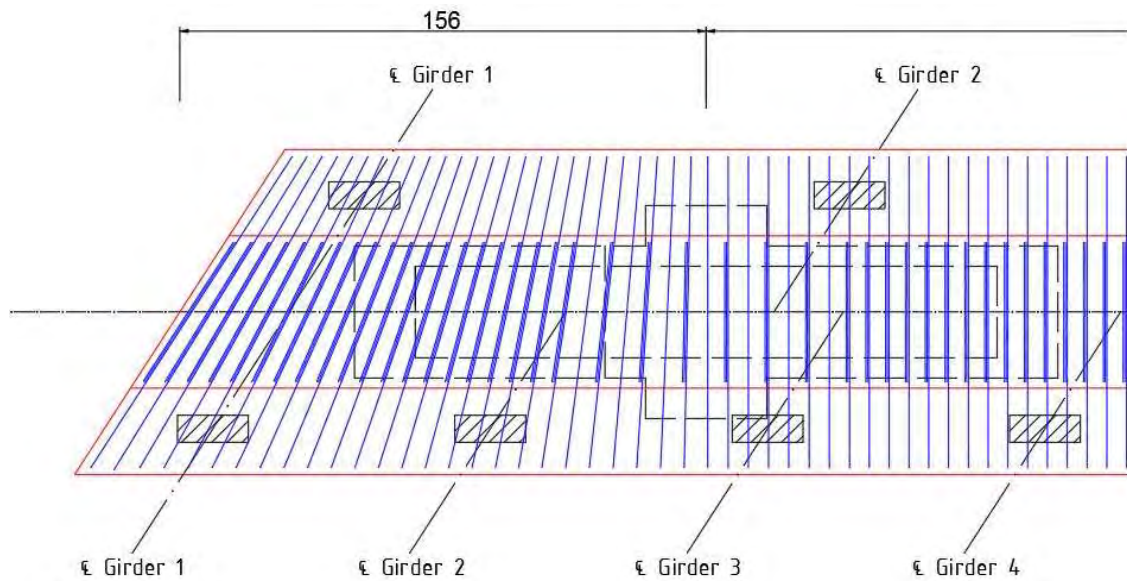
Case 2 for Bent 7 (Traditional Detailing of Reinforcement without End Bars, unit: inch)
